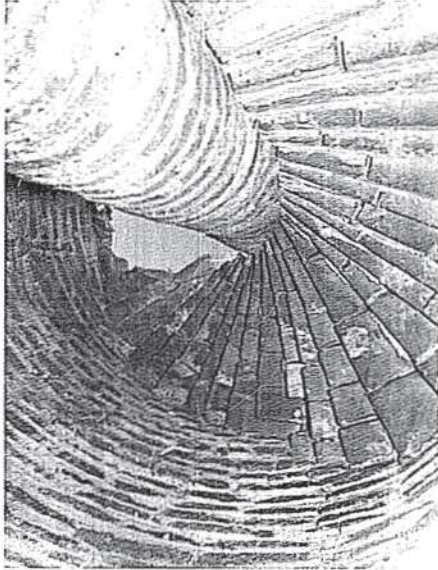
The detail of step underside and core in Malatya White (Ak) Minaret.
